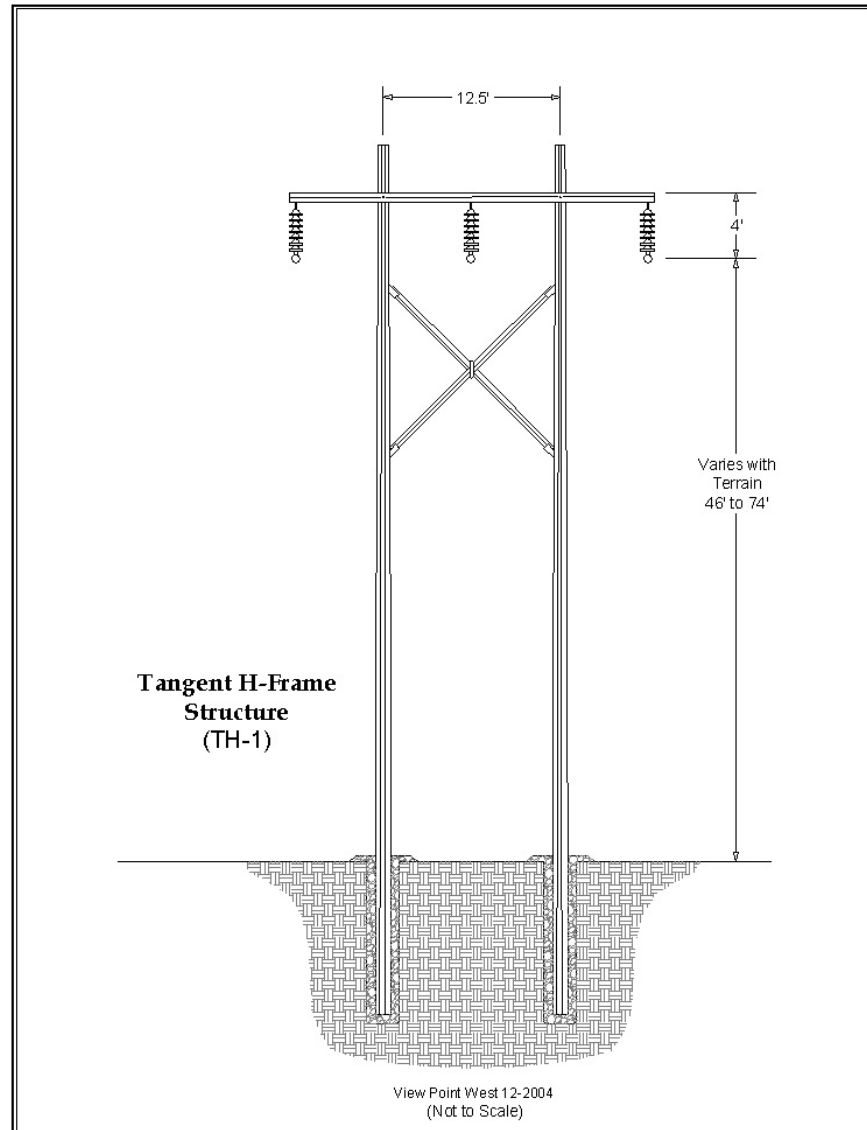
Typical 115kV H-frame Wood Pole Structure
